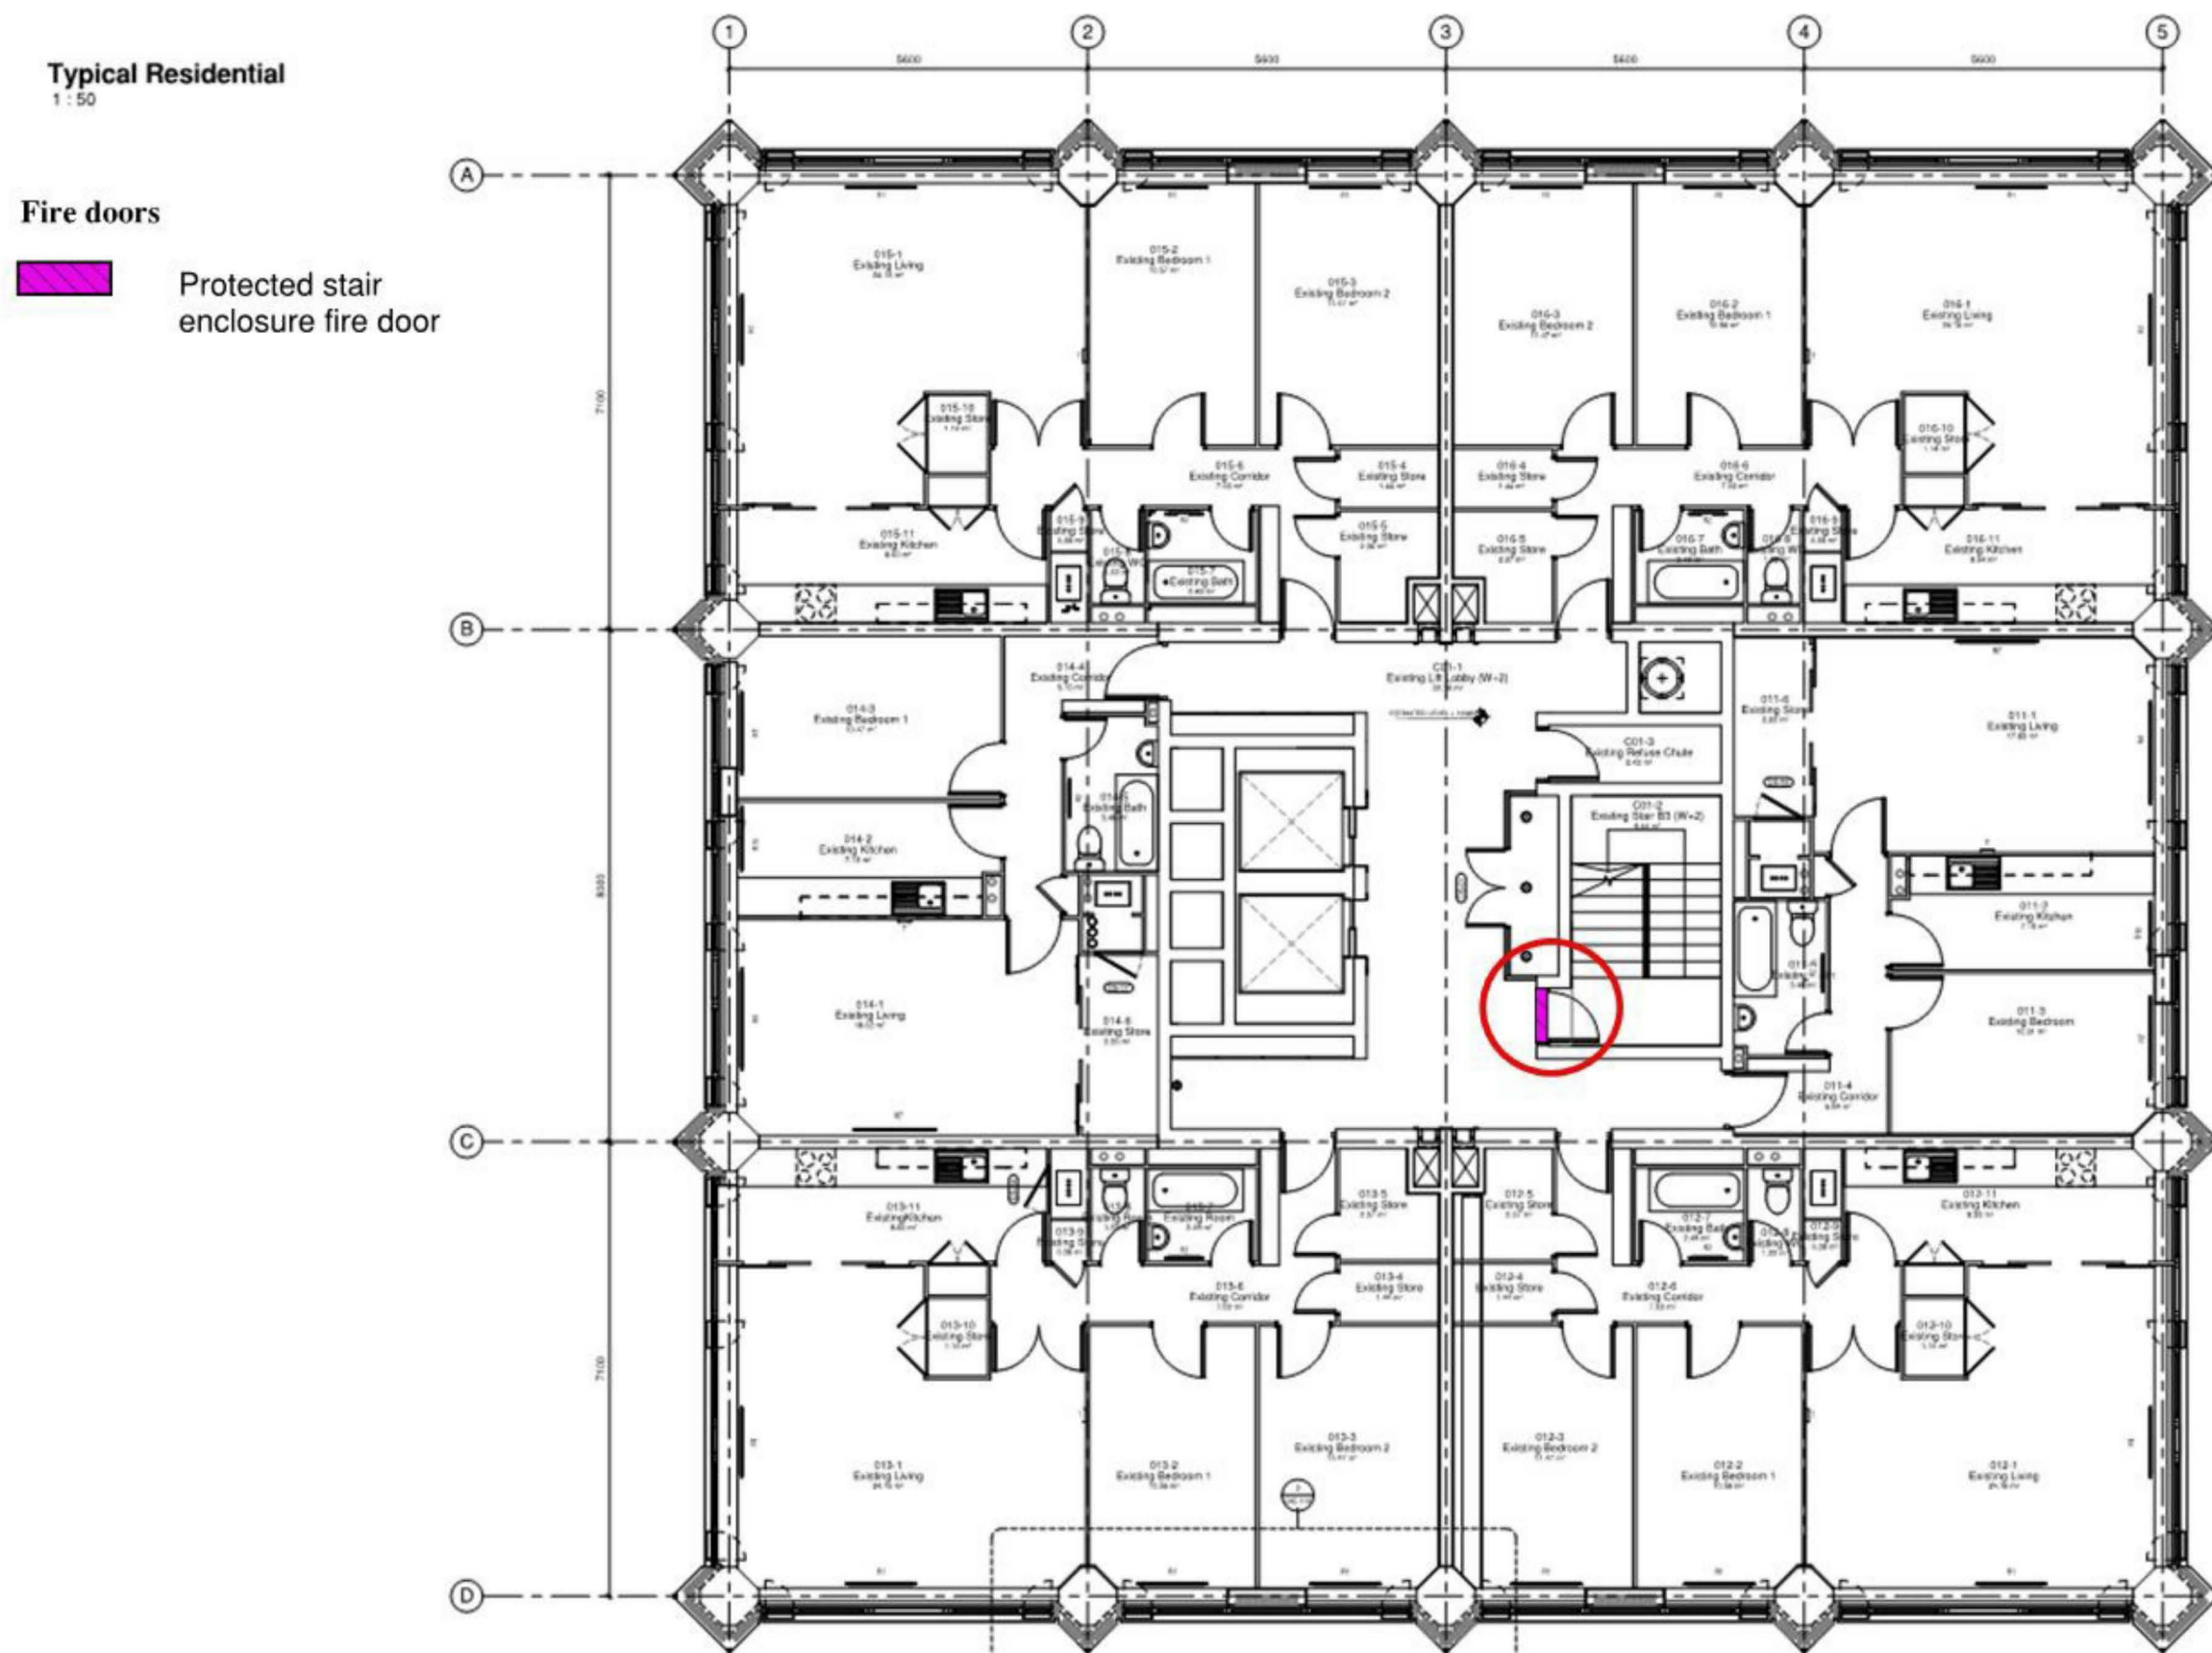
Location of door to protected stair enclosure (door circled in red)(SEA00010474)
